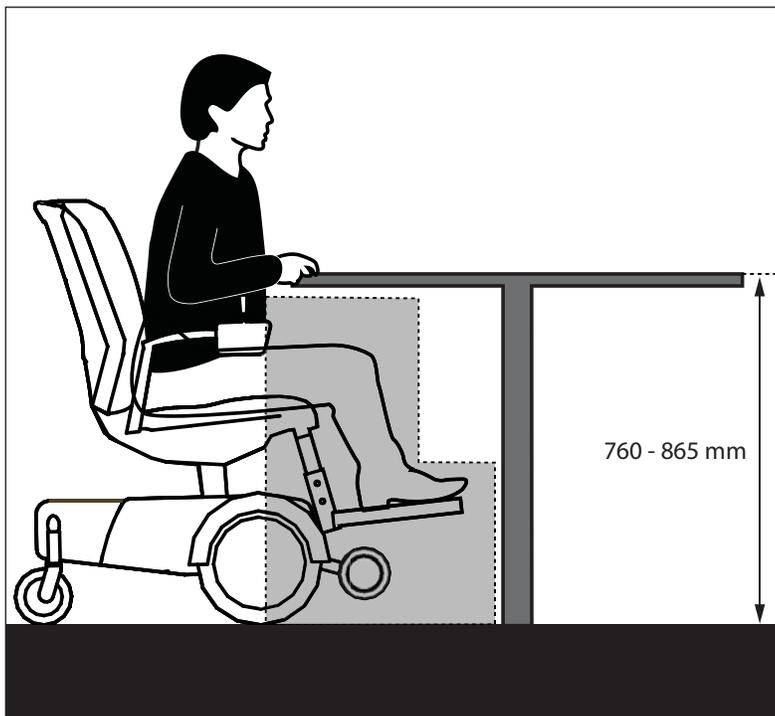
Typical Accessible Bench Dimensions - Section View
